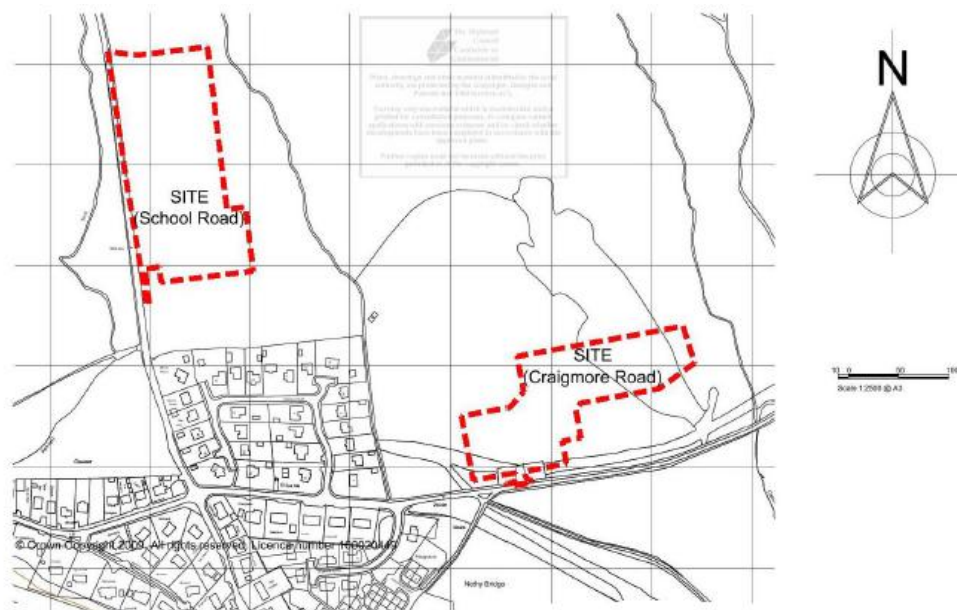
Plan showing the Application Sites (Extract from Drawing No 3879/01-01 – for illustrative purposes only).
